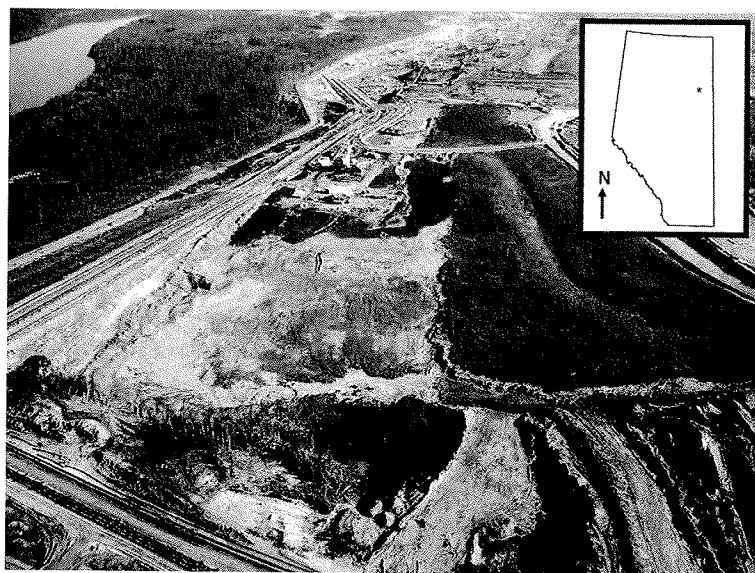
Looking north at the Suncor Fen site known as the TLC, pre-construction, on Suncor's lease in Fort McMurray, AB. The site approximates 675 m at its widest extent near the south end. (Photo credit: Gord McKenna.) (See color plate section for colored image.)
